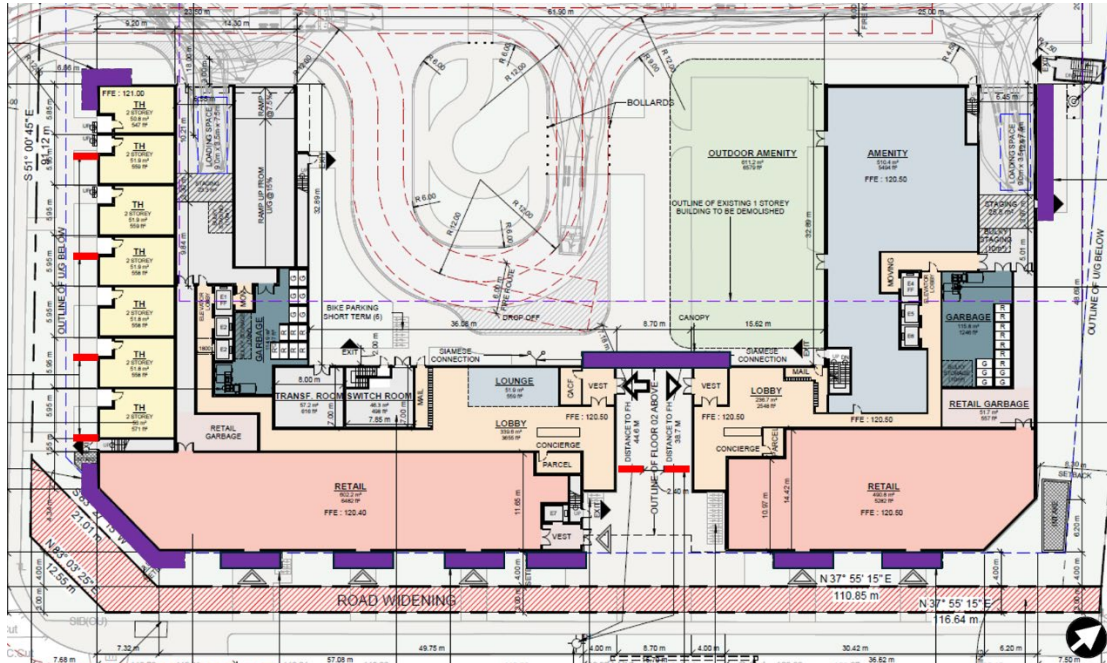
Latest site plan provided to CPP on 15 May 2026 (Drawing A151)
